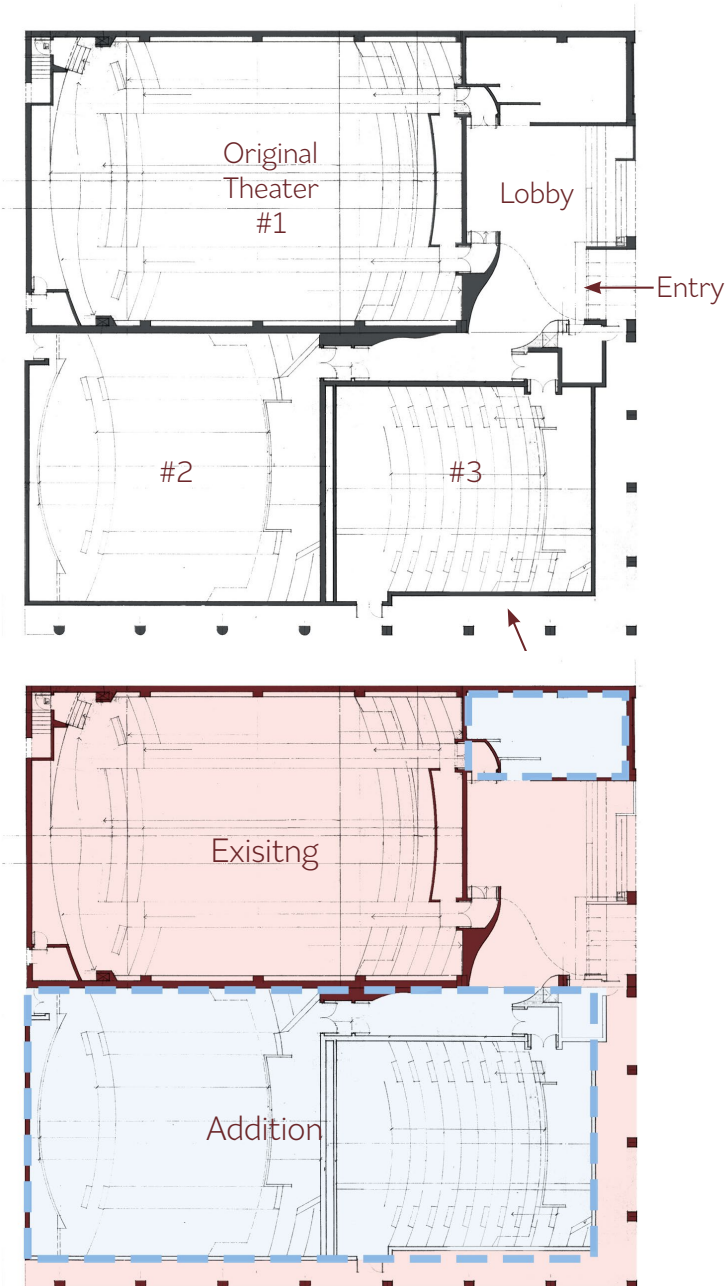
Existing Ground Floor Plan of SIFF Uptown Theatre
